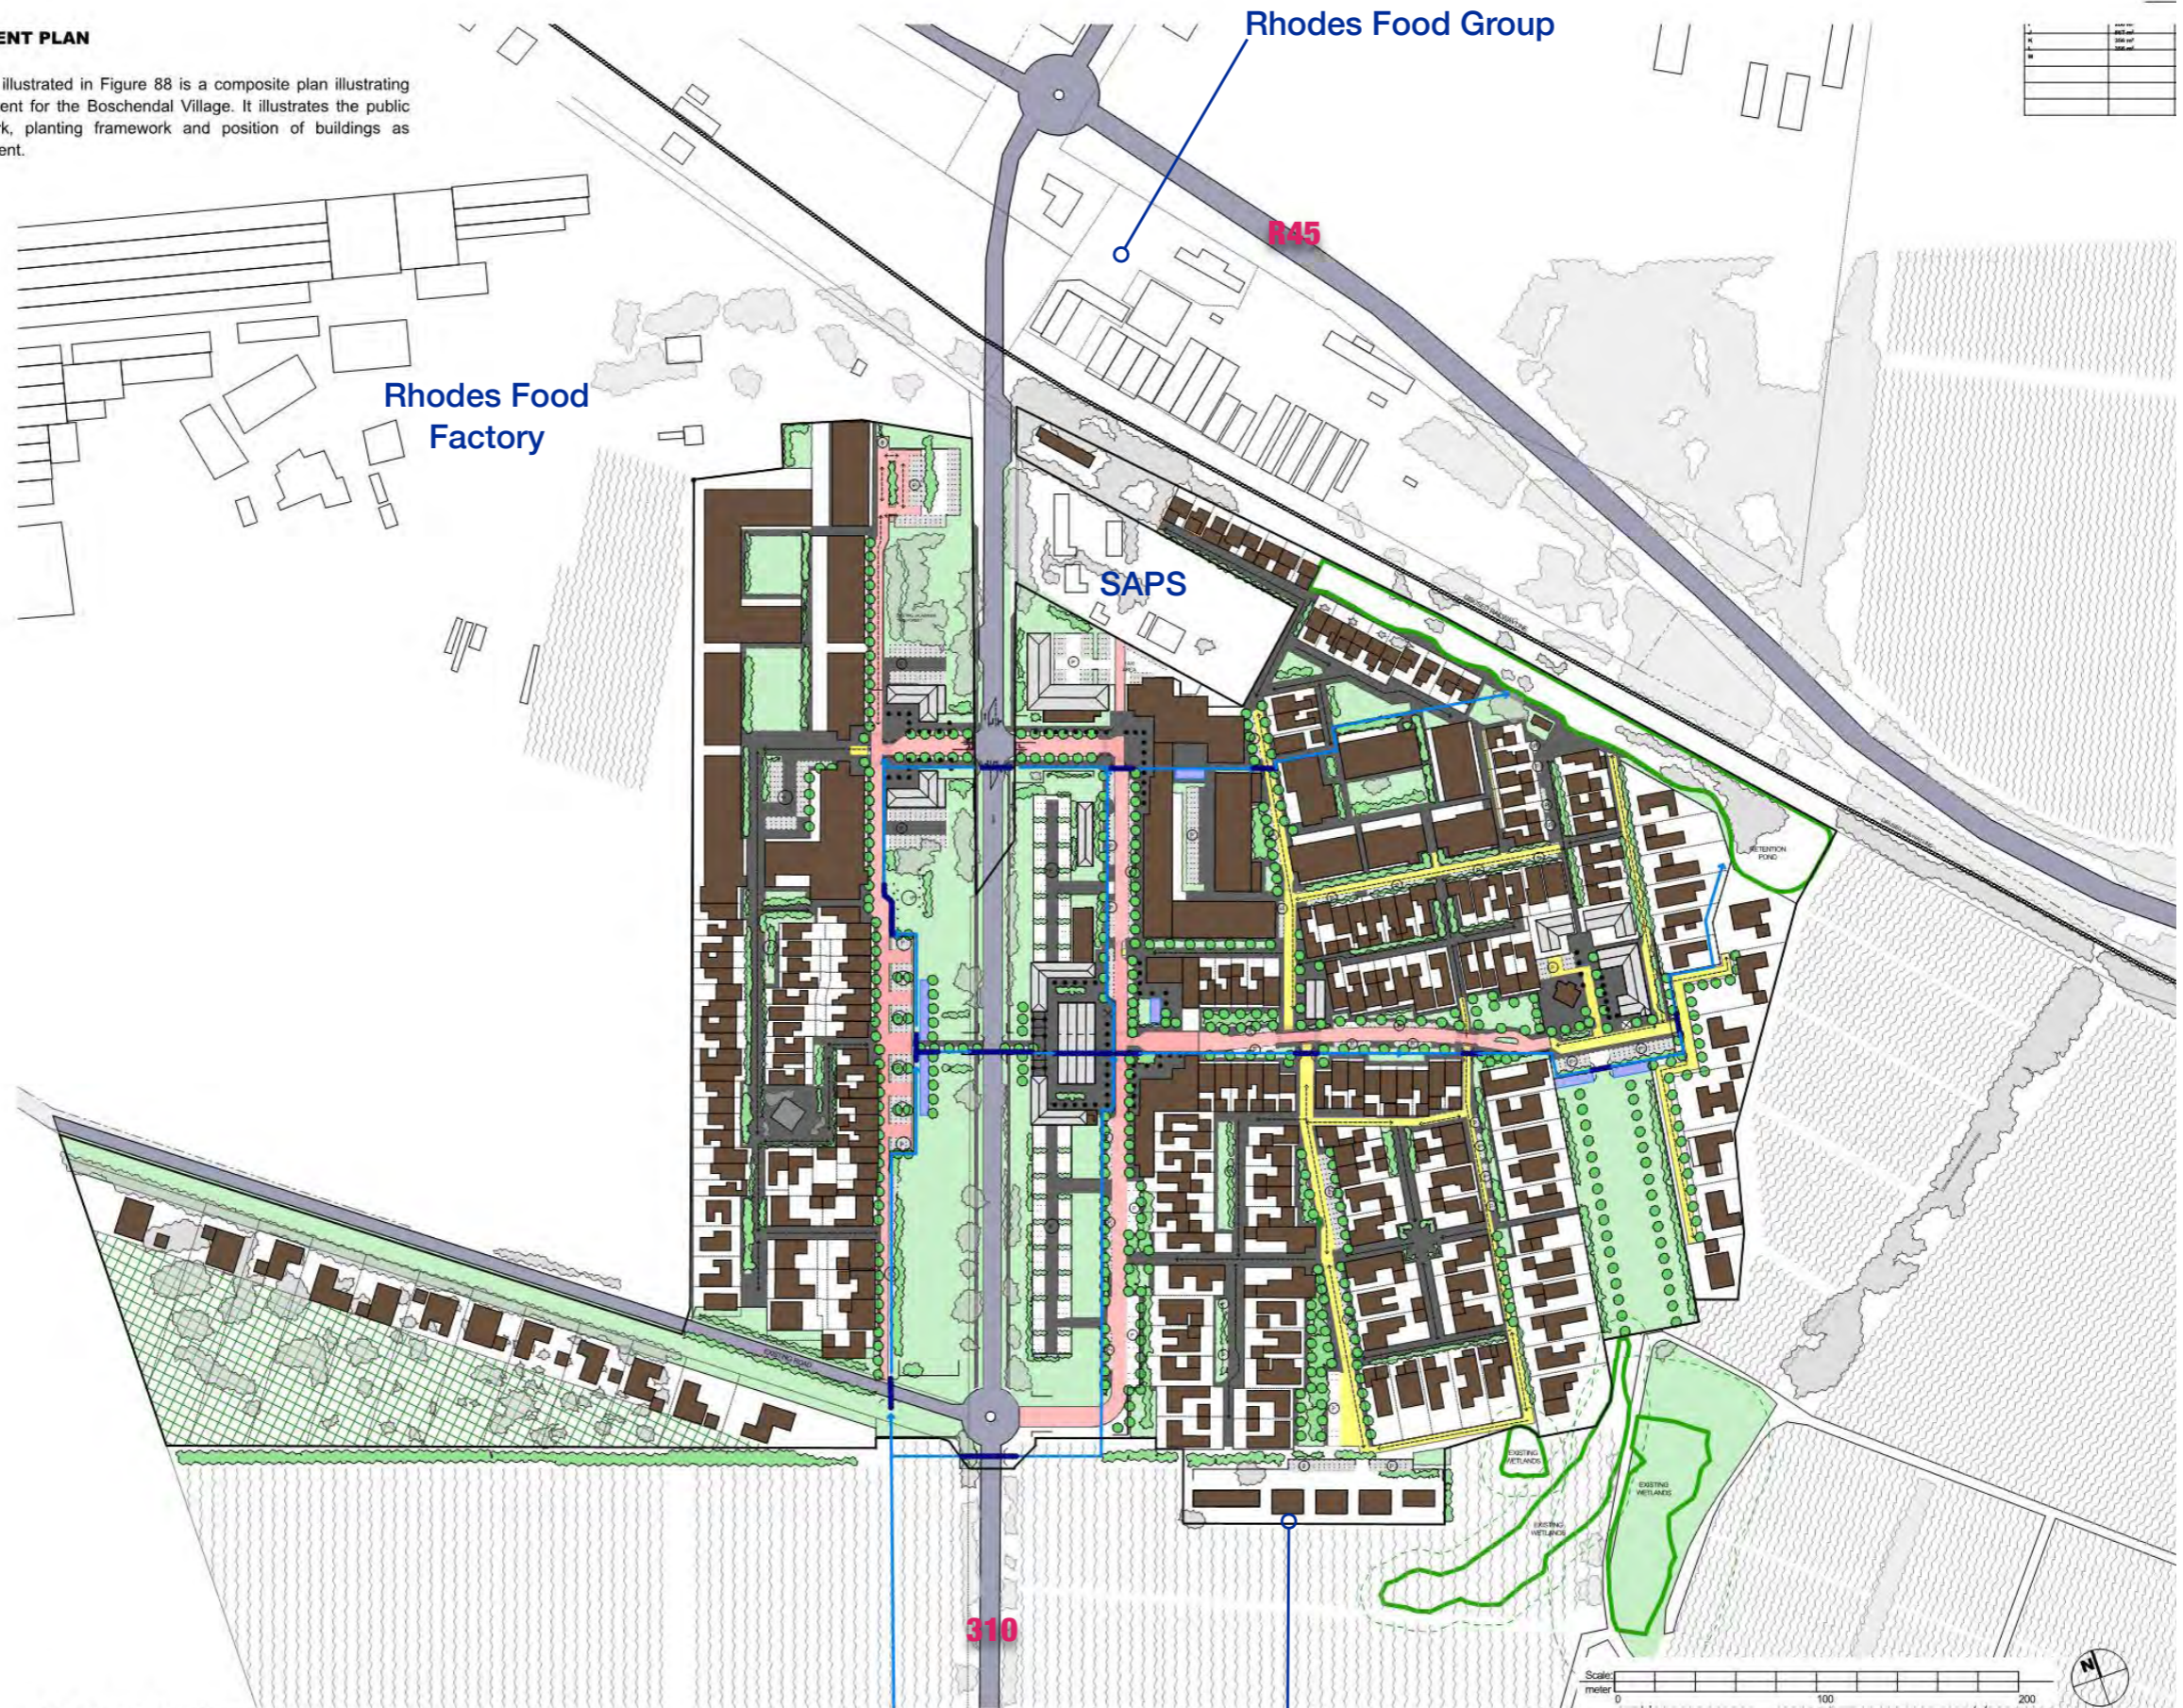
Site Development Plan | scale 1:3000 @ A3
